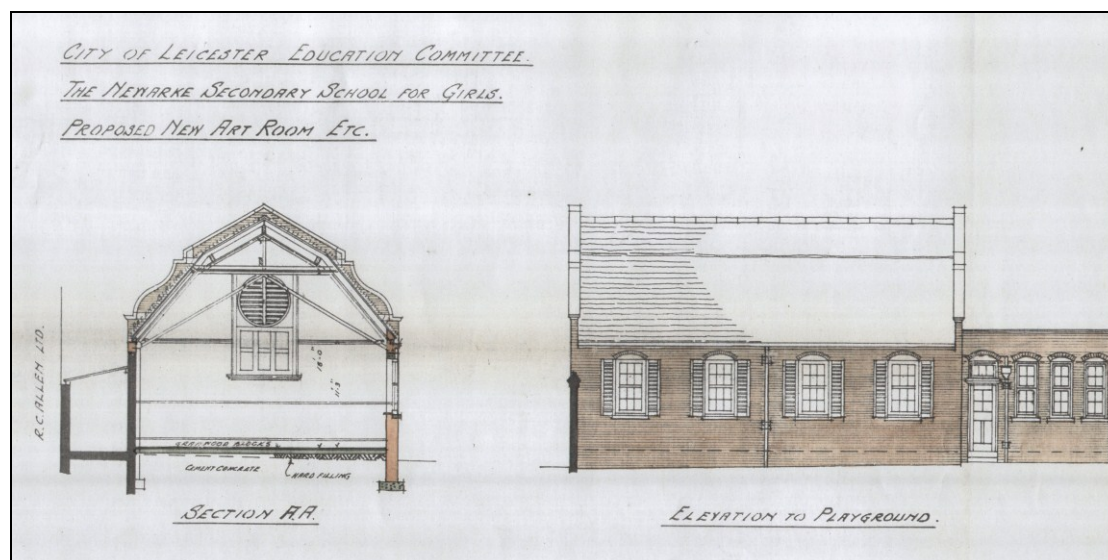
Original architects drawings of new art room for Newarke Secondary School for girls. (LBR Plan 1927/34028. Not to scale).
